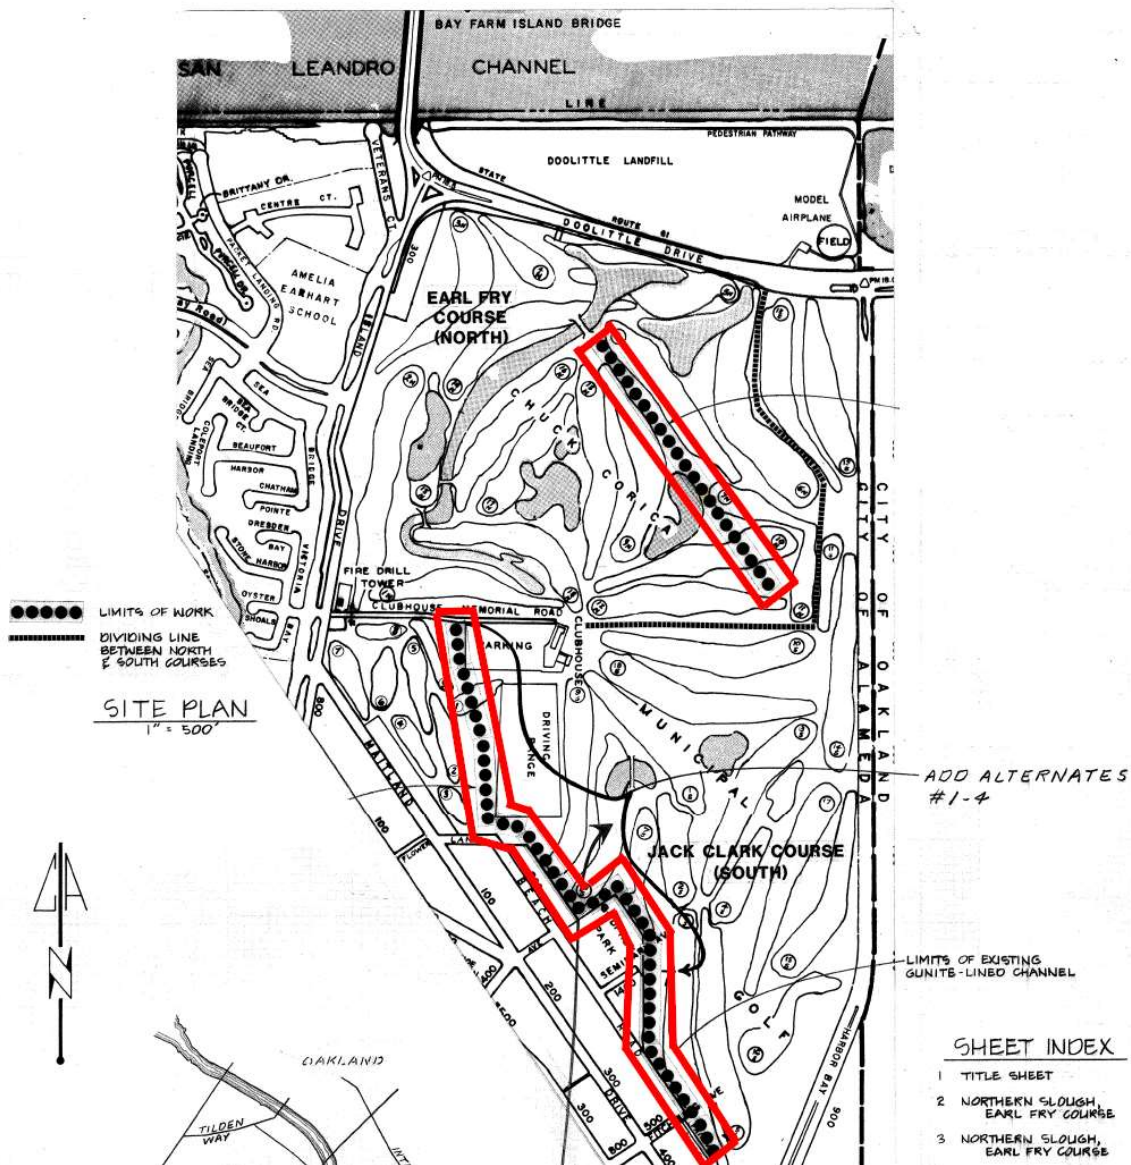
Asbuilt “Drainage Improvements, Chuck Corica Municipal Golf Complex” Improvement Extents (red)
